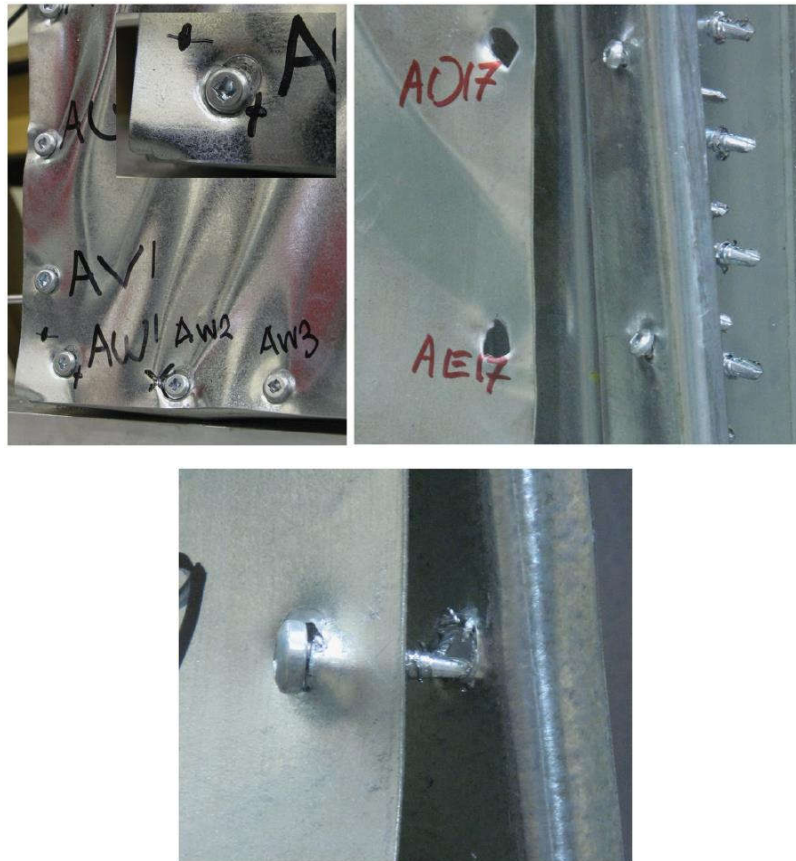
Typical sheathing-to-framing screw failure modes: at top left: bearing of sheathing, at top right: fastener pull-through and at bottom: fastener pull-out [17].
